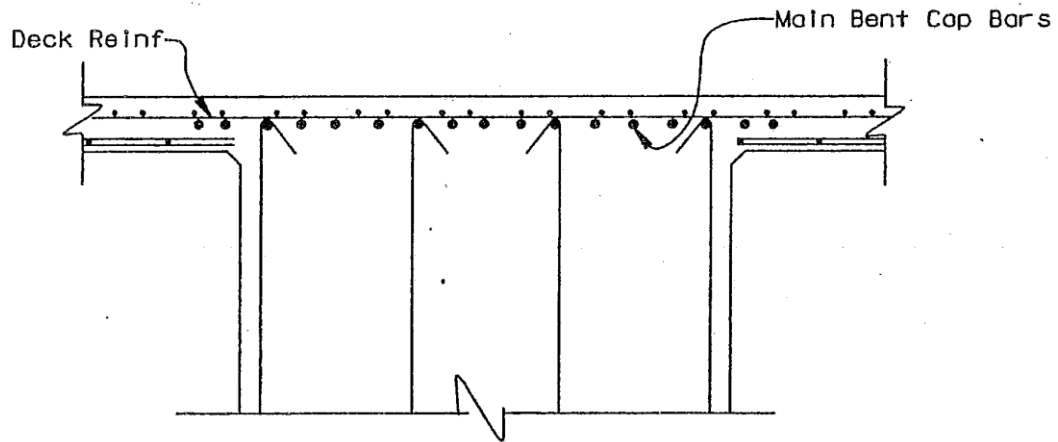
Bent Cap Reinforcement (Skew $\leq 20^\circ$)
